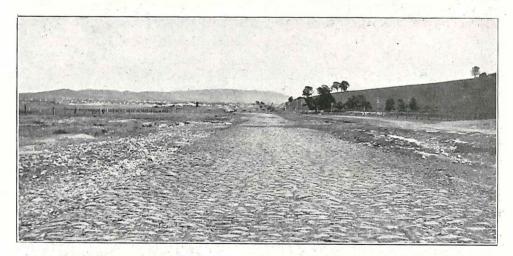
Showing neglected section, Ballarat-Stawell Road, now being re-constructed.
